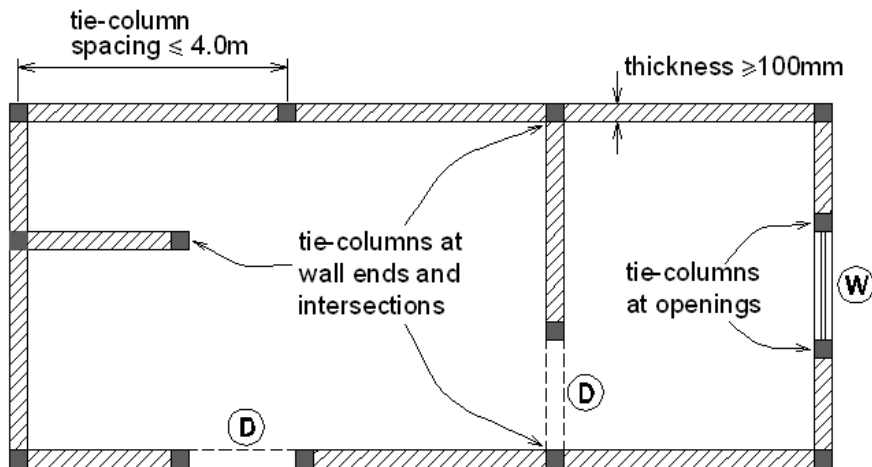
A sample floor plan of a confined masonry building (Brzev, 2008).
